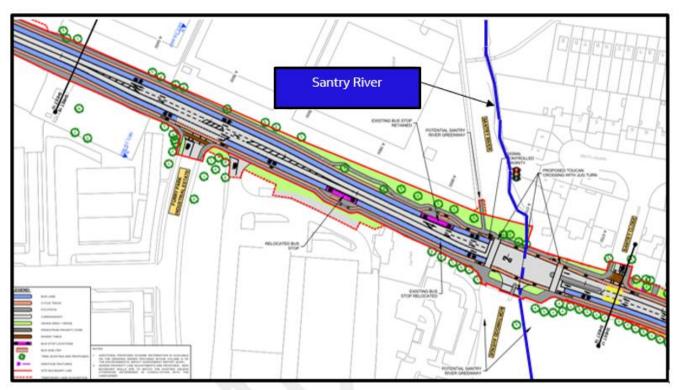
Proposed works around the crossing with Santry River on R132 (around Ch. A05 + 700)
